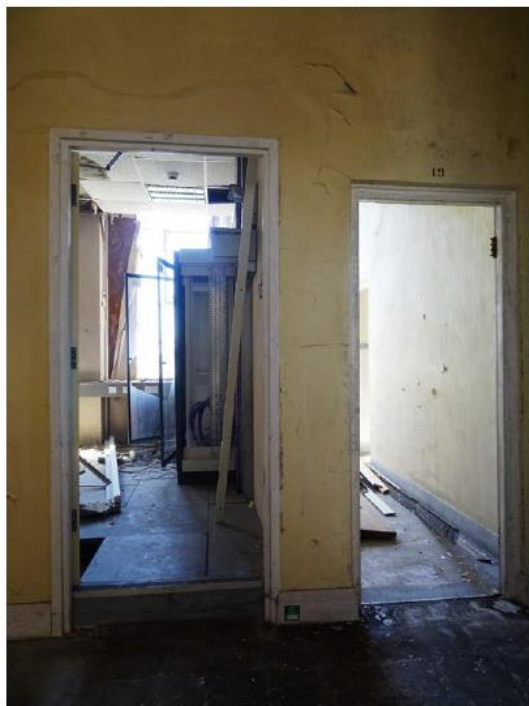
Doors to the computer server room and the WC at the south-west corner on the first floor
